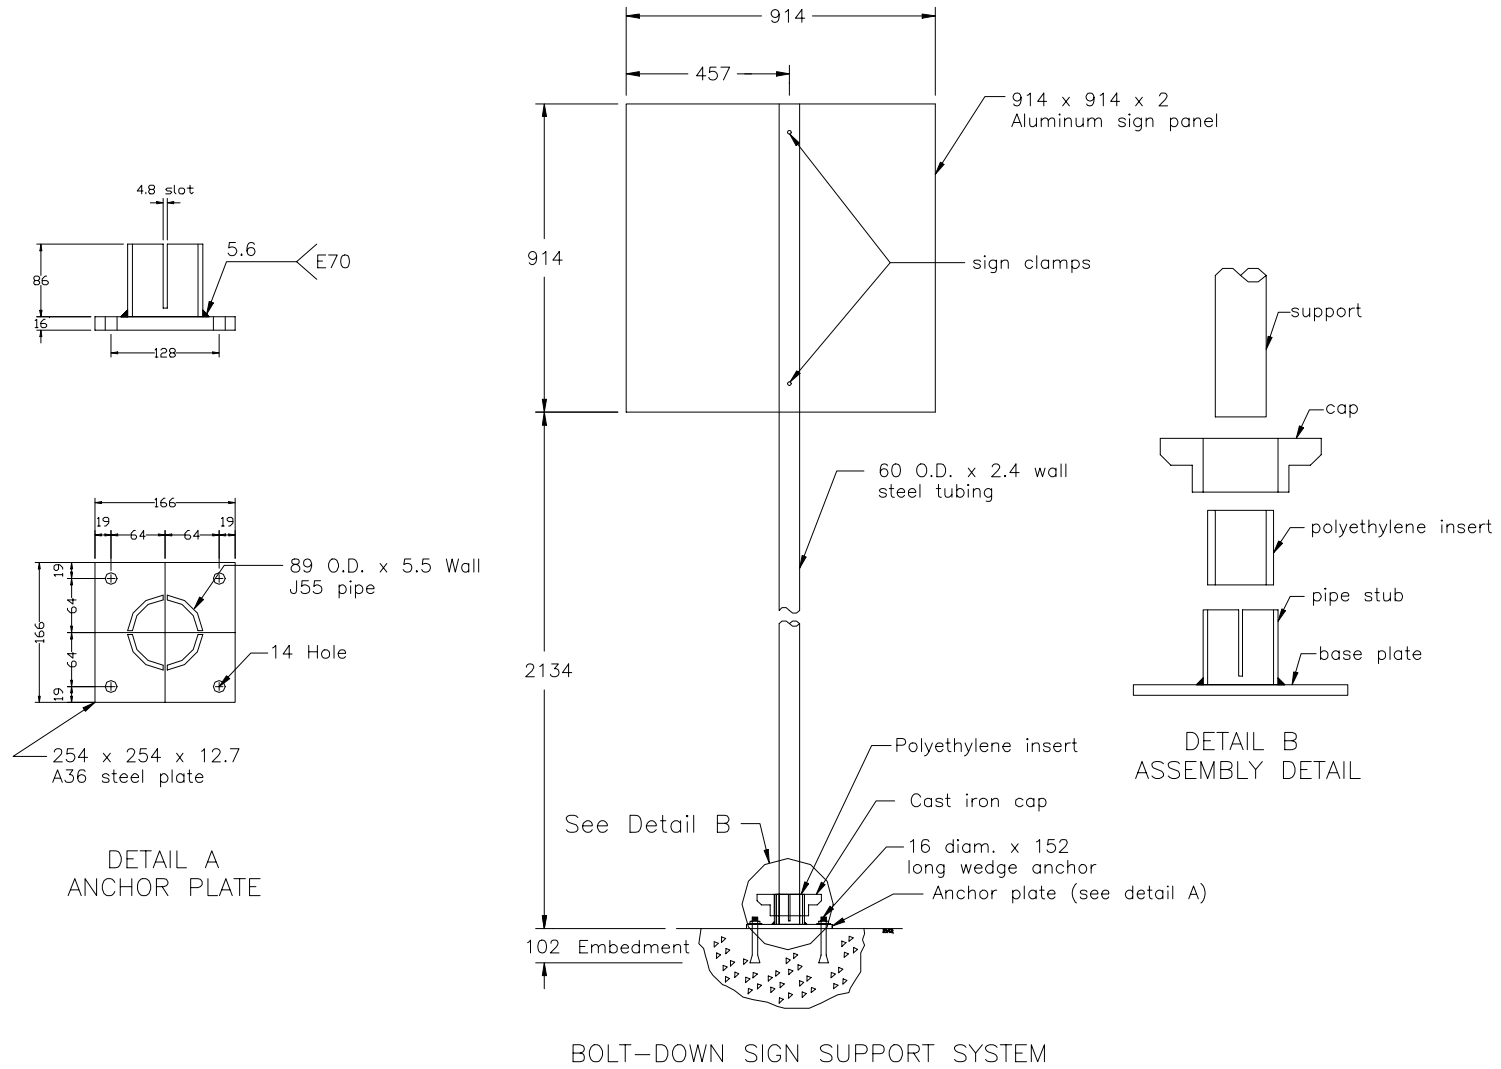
Details of the Installation Used for Evaluation of Support Bases Bolted to Concrete Pavement in Test 439117-5.
